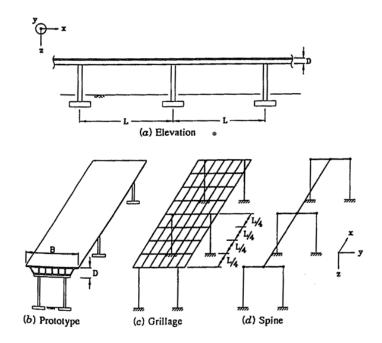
Superstructure Models (Priestley, et al 1996)
